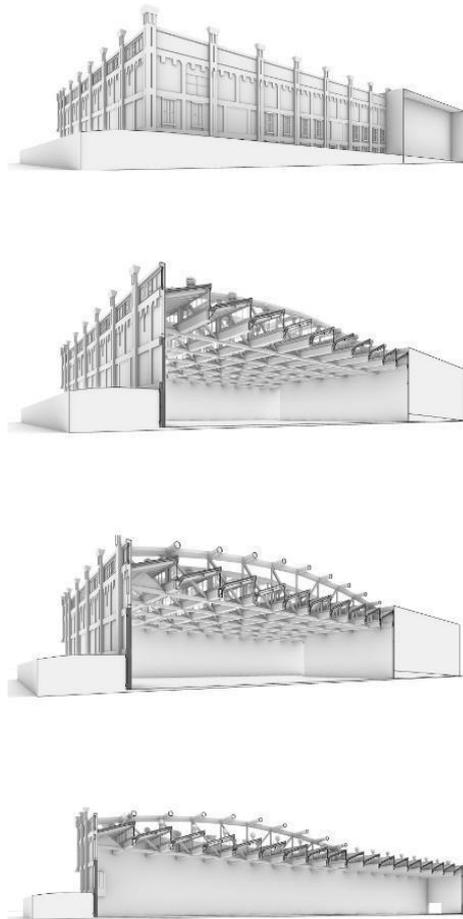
The sequential sectional perspectives to demonstrate the roof structure that consist of the various components include the reinforced concrete bowstring trusses and saw-tooth roof system.
